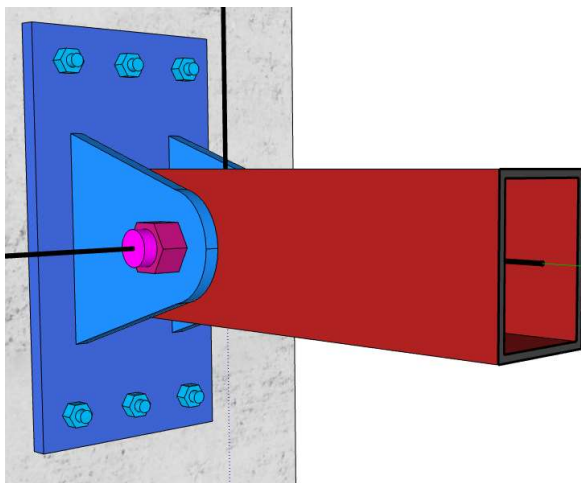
Plate connection between steel beam and concrete column (Detail from Interactive CAD model)
